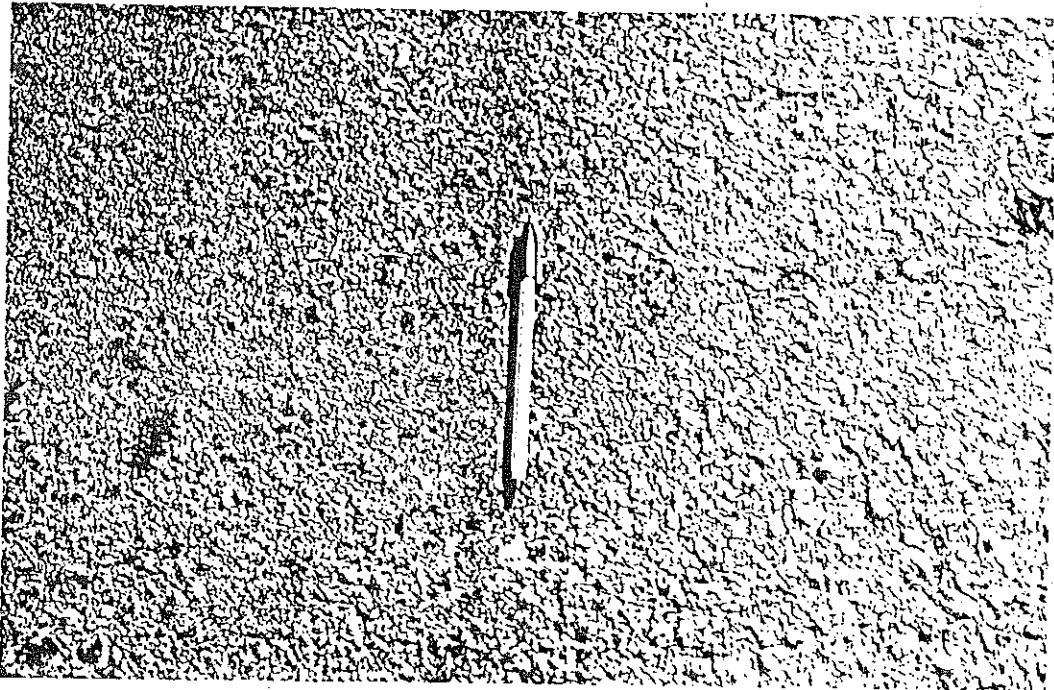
ANOTHER VIEW OF SURFACE TEXTURE ON BASE COURSE WITHOUT WEARING COURSE
